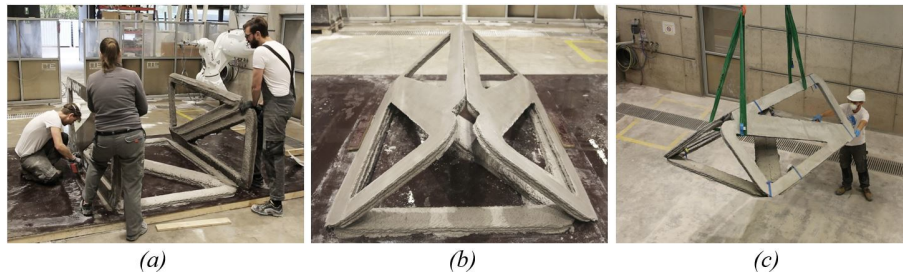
Assembling process of one module: (a) assembly with three people; (b) as-assembled element; (c) positioning using a crane.
